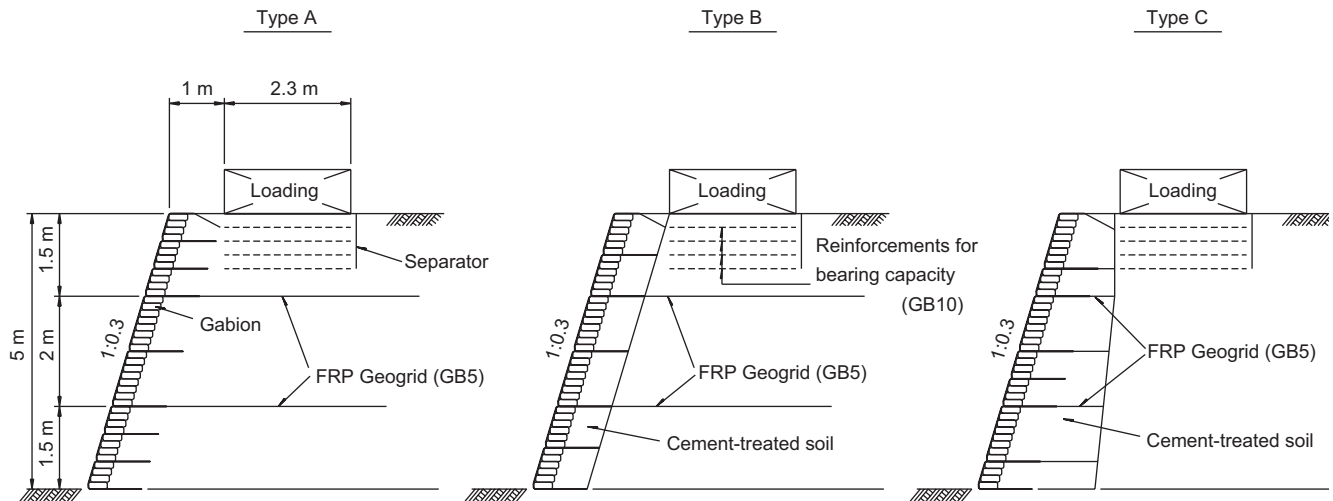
Cross-section of the FRP geogrid-reinforced retaining wall, Japan (Miyata and Kawasaki, 1994).
